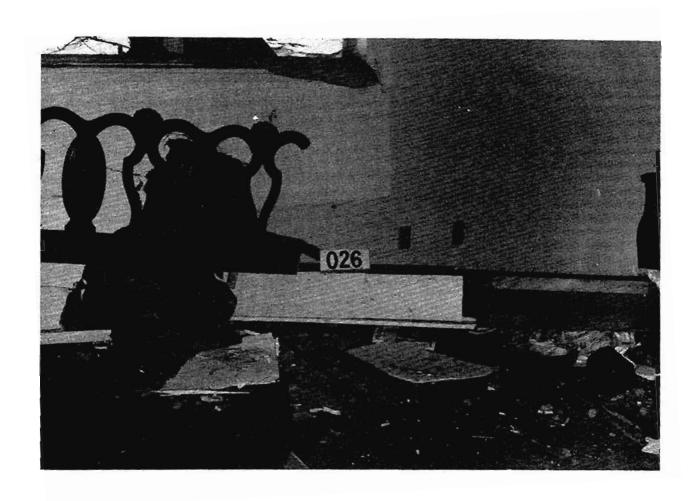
LARGE BEAM PERFORATED RESIDENTIAL WALL IN PLAINVIEW, TEXAS. The beam was attached originally to a carport roof which came to rest opposite the wall shown.
